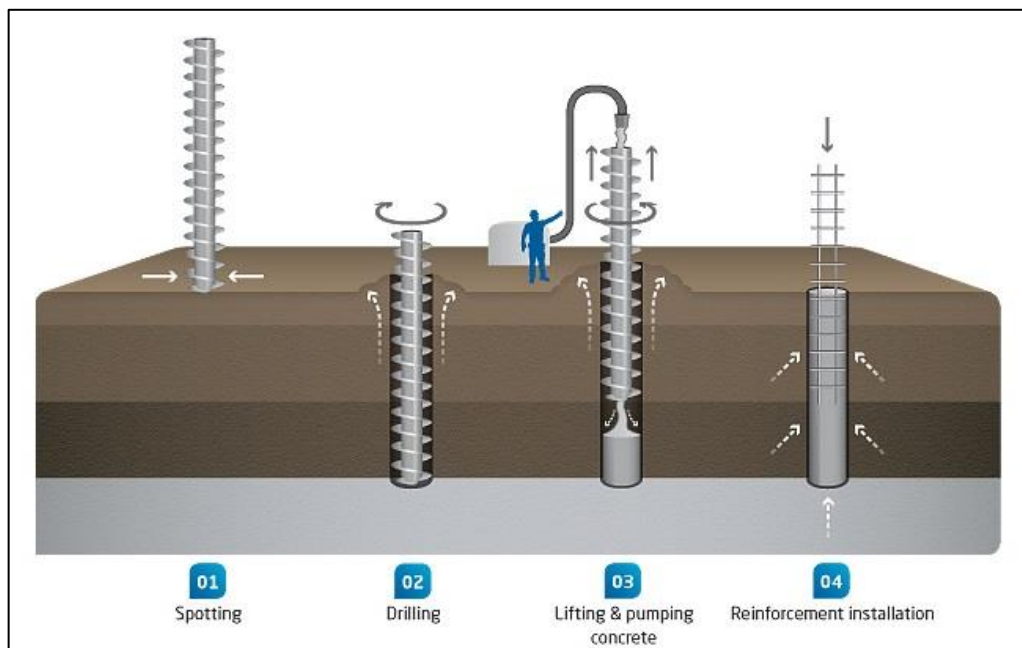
Execution sequence of CFA piles (adapted from [www.junttan.com](http://www.junttan.com))
